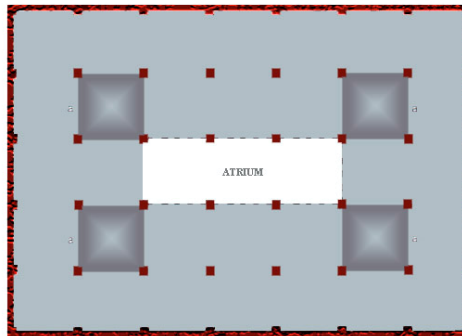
Underground building plan illustrating the hard-to-daylight spaces adjacent to the atrium corners.
